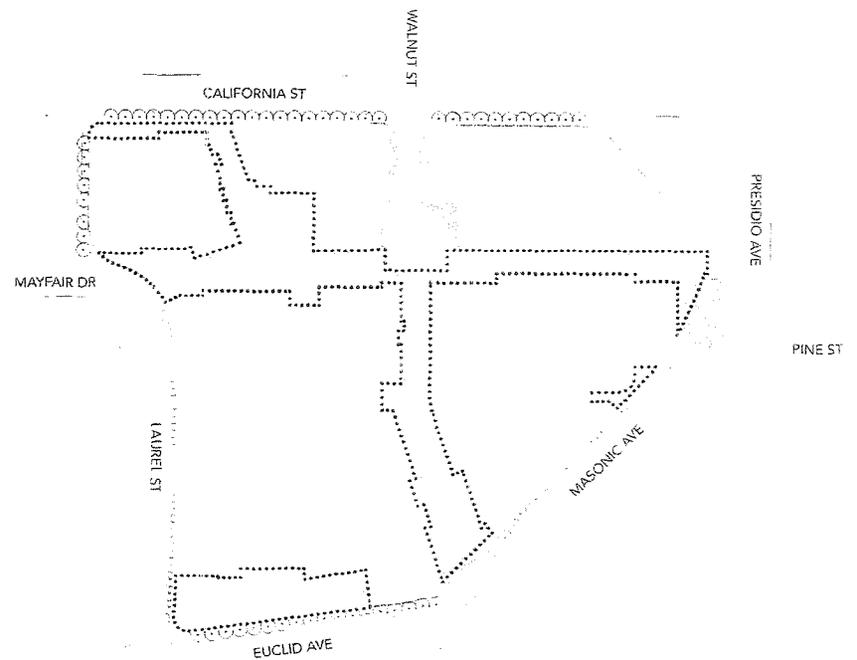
Site Plan showing features ca. 1957–1963. Source: Garrett Eckbo, *Urban Landscape Design*, 1964
